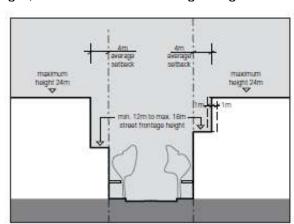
Street Frontage Height Type E. Street frontage height of new development should respond to existing adjacent built form and be in the range of 12-16 metres. Above the street frontage height buildings are to be set back 4 metres.
